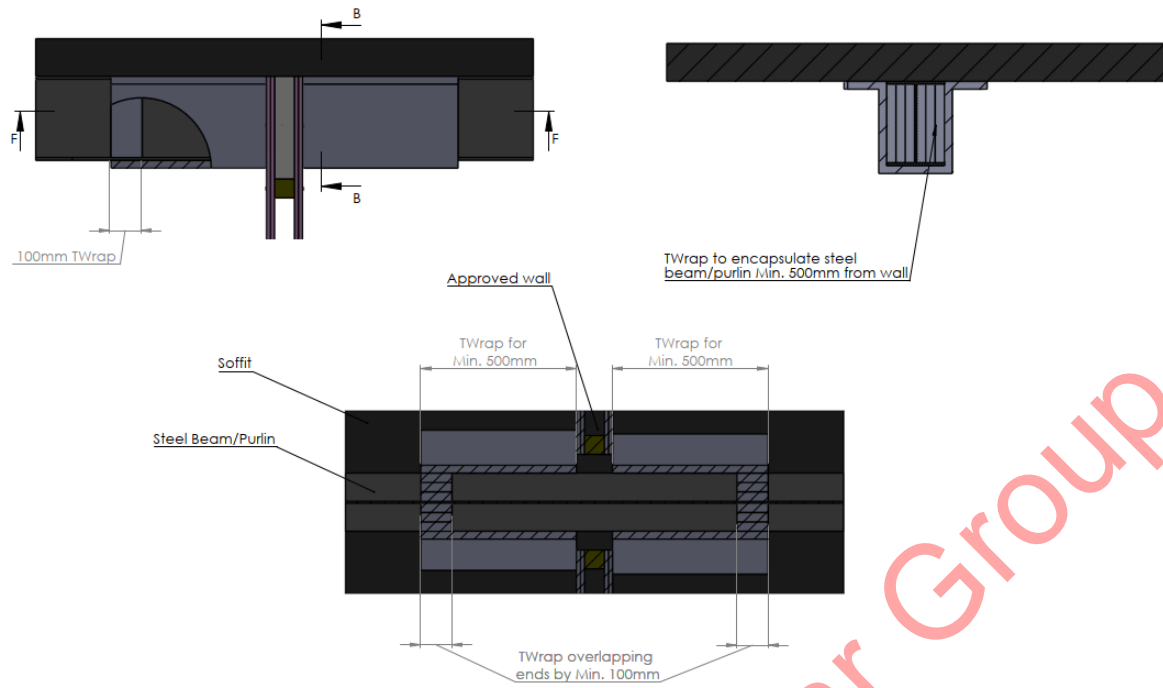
Proposed steel beam/purlin penetration system – detail 6
